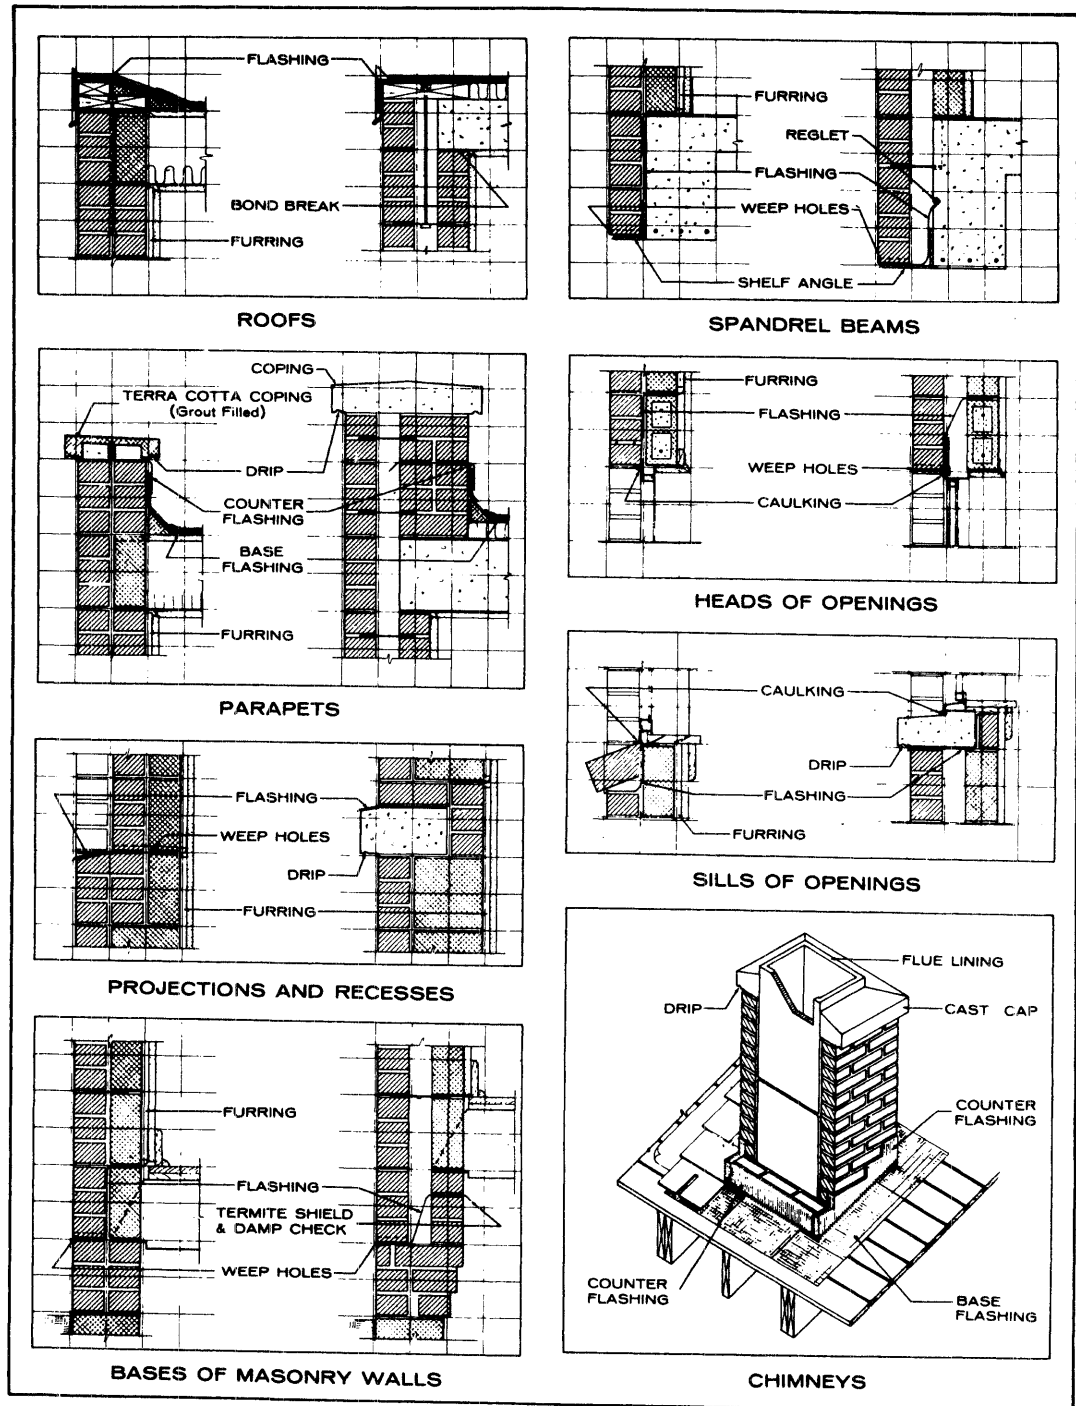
Flashing used in brick masonry construction. (Courtesy of The Brick Industry Association)
